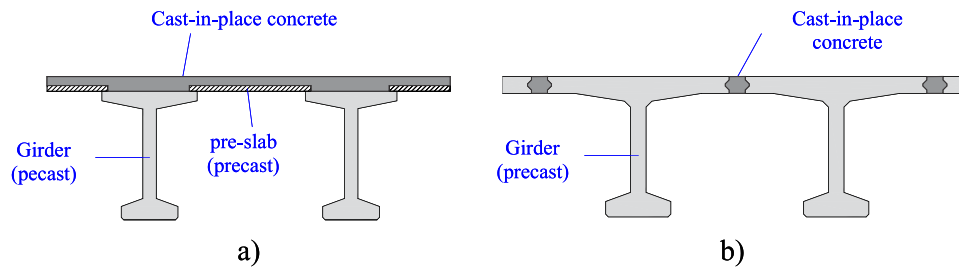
a) Cast-in-place concrete for a) precast slabs between girders and b) full-depth precast slabs (bulb tee girders).
